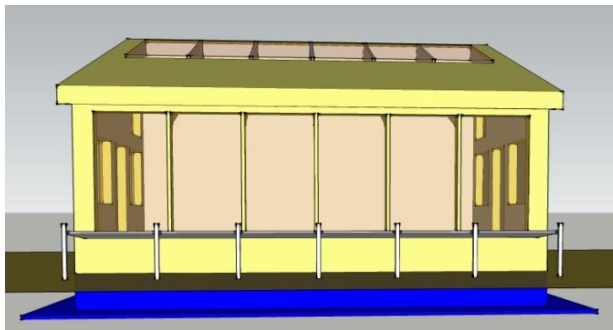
South elevation of 400 square foot stand-alone greenhouse. Note perimeter insulation below grade shown in blue. Four varieties of moveable insulation are under consideration for the vertical glazing on the south wall.
